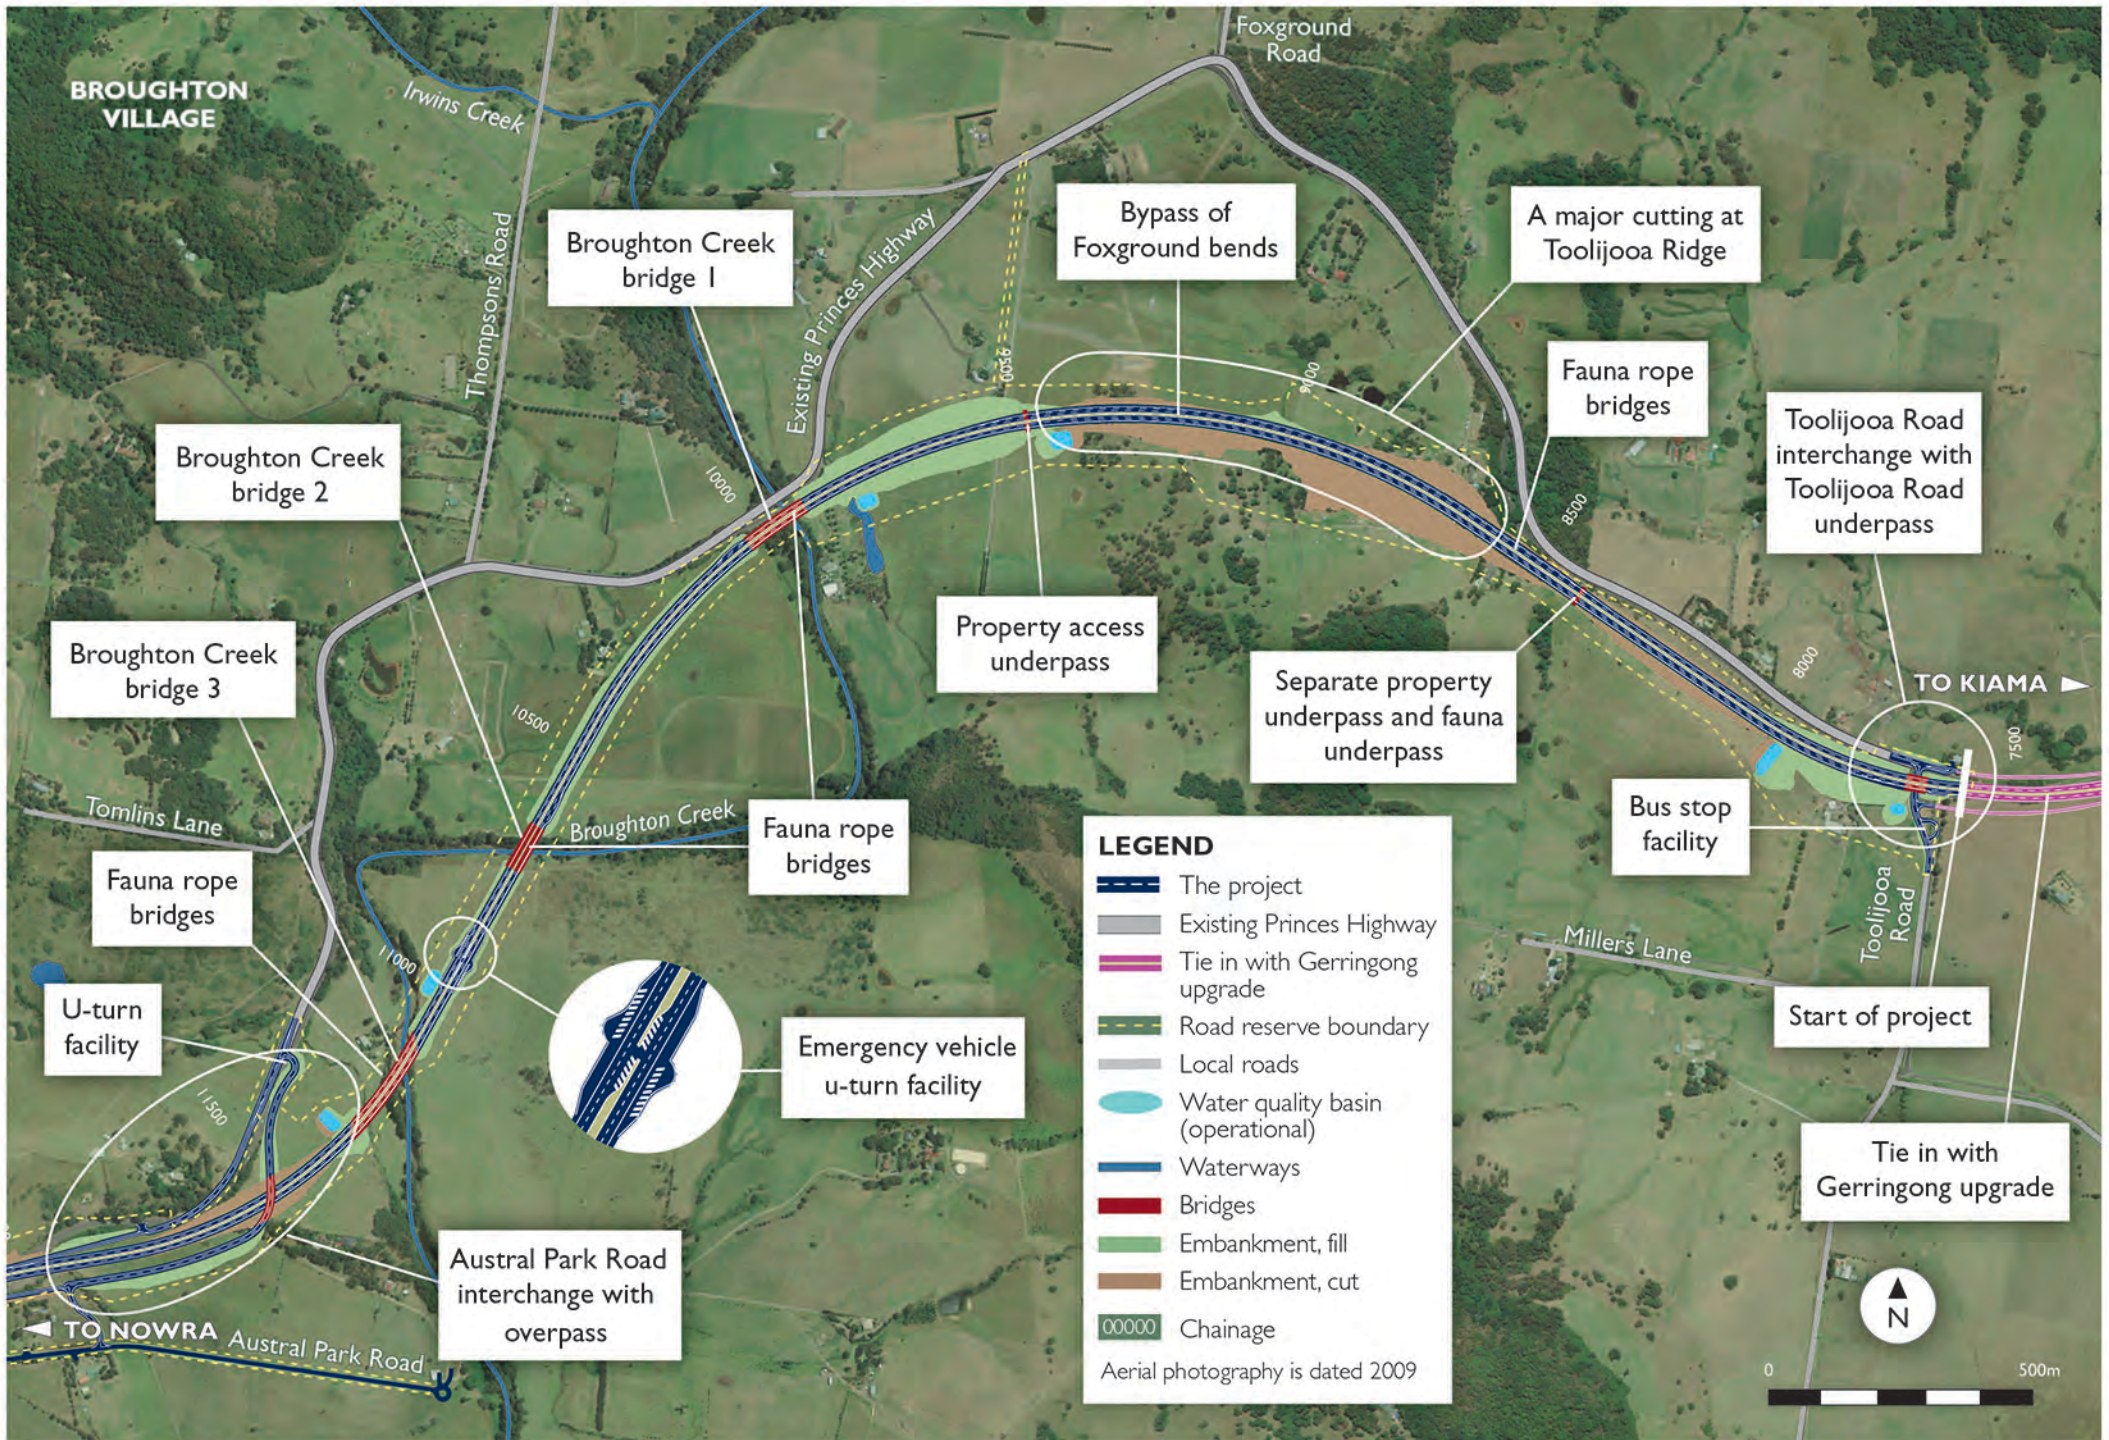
Section 1 (Toolijooa to Austral Park Road)
